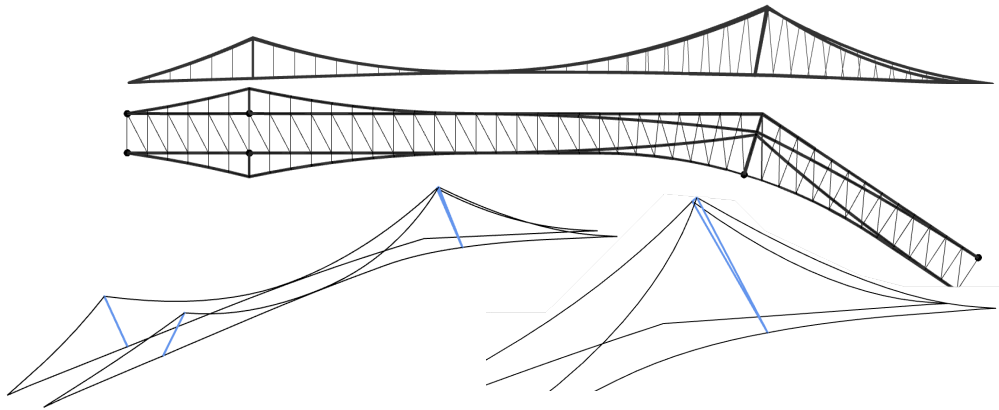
Elevation and plan of the suspension bridge geometry (top). Clear view on the modelling of the pylons. At the right side of the bridge, the main cables are supported by a single pylon that is modelled as a triangle to correctly model the distance between the main cables (bottom right).
